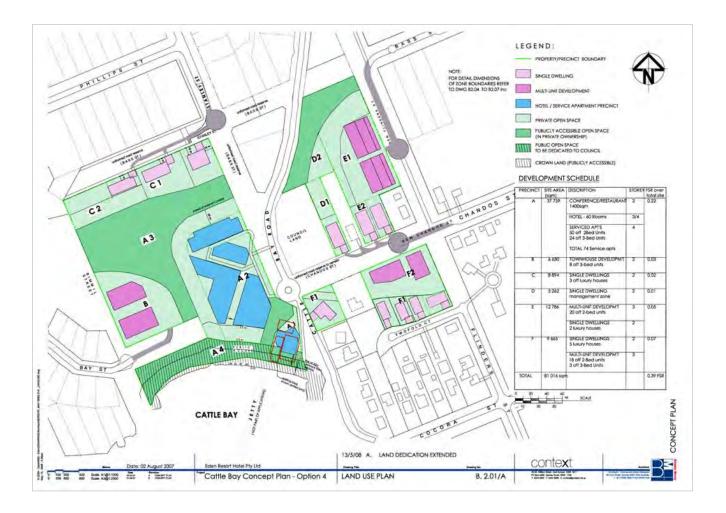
Approved Concept Site Plan (Drawing B.2.01/A Rev A 13/05/08)
